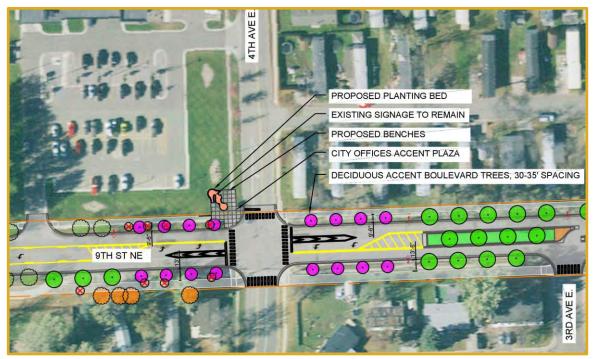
Accent Plaza Concept at City Building Intersection of 9th Street and 4th Ave East
